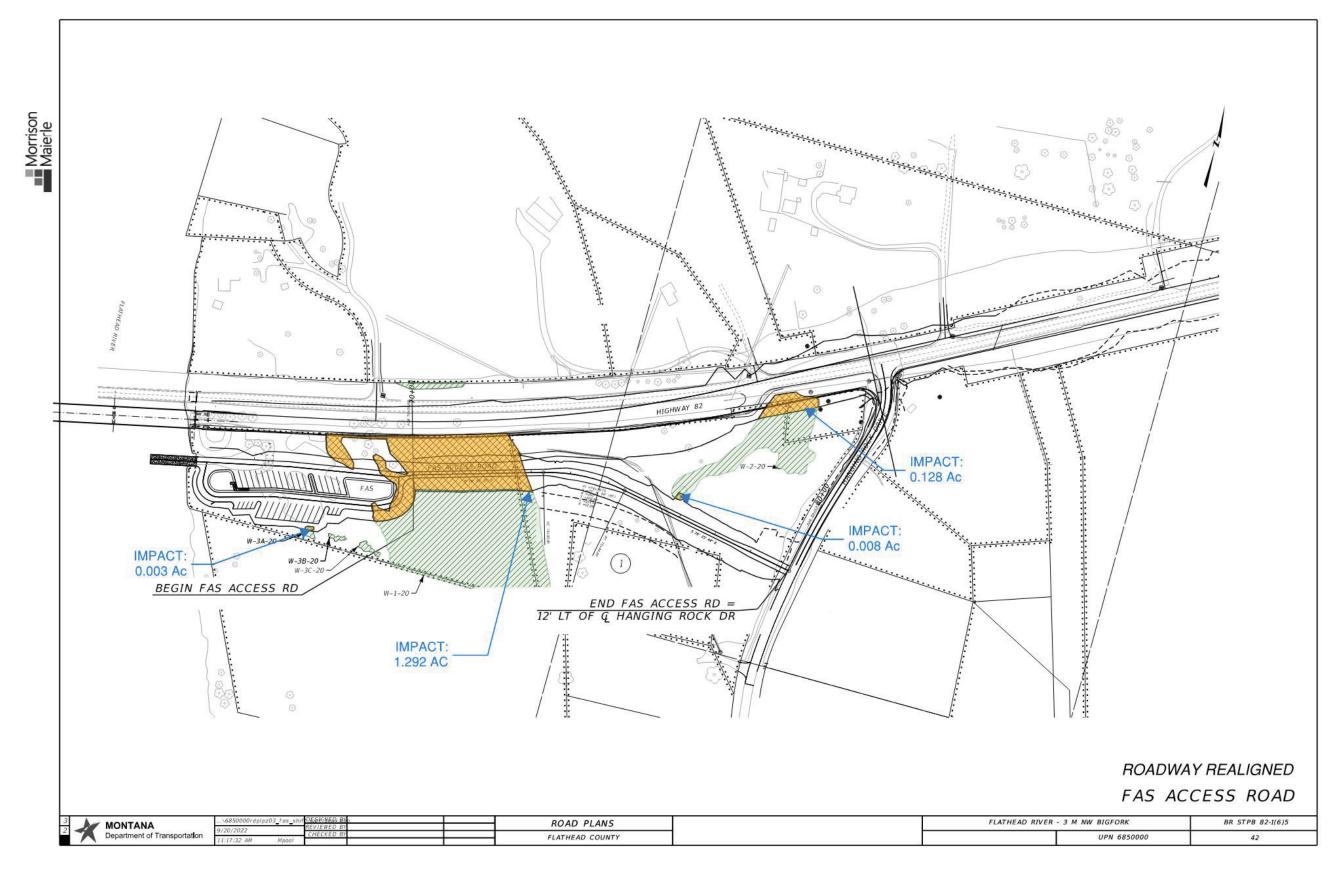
FAS Design Option 2 – Southern FAS Access Road Alignment
